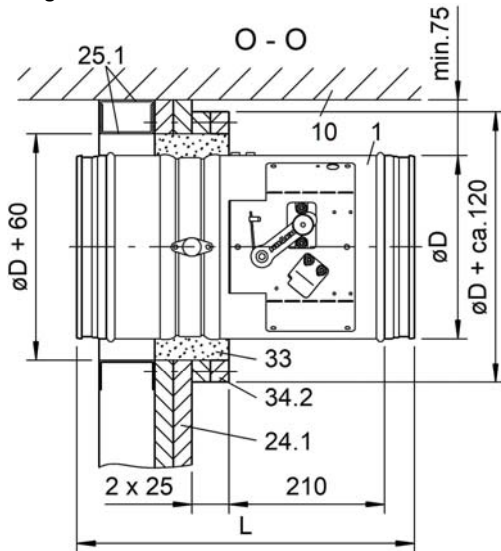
Wet installation in shaft wall under solid ceiling (BSK-RPR 100 to ≤ 250)
